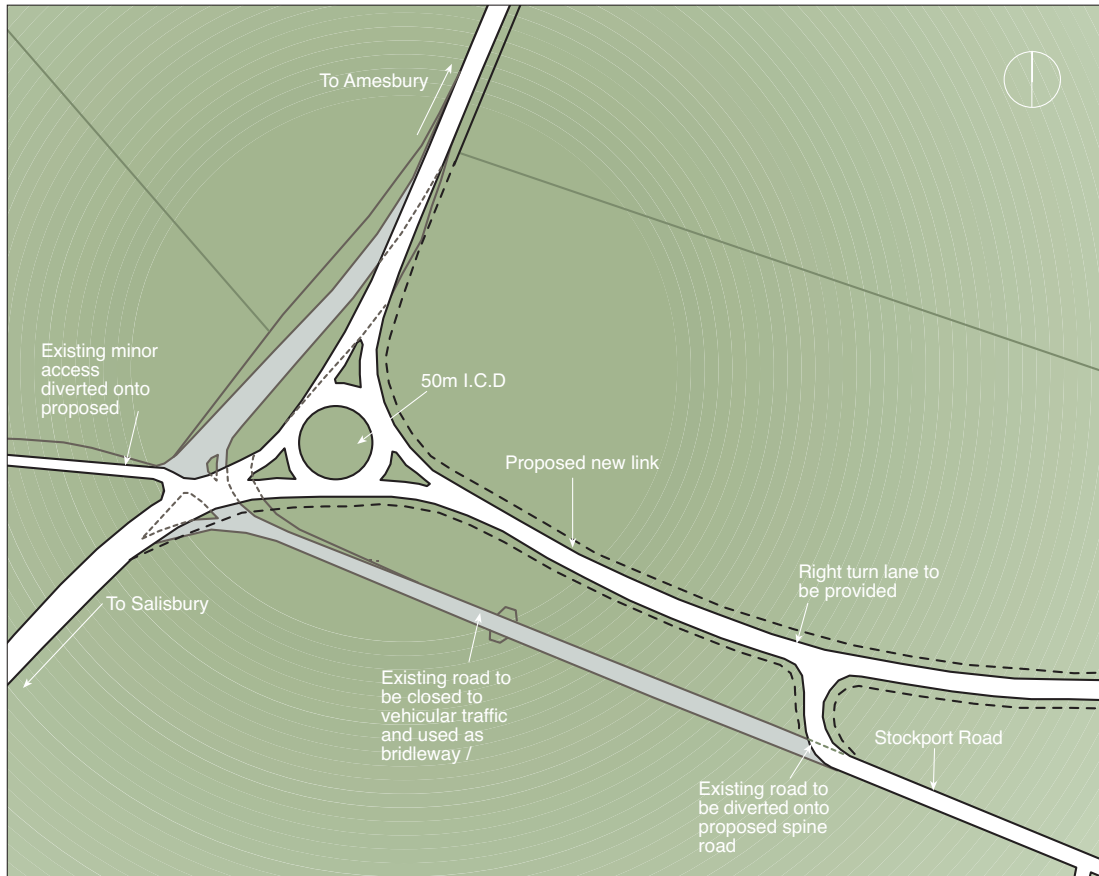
The design of the proposed Stock Bottom roundabout and the junction of the link road with Stockport Road
